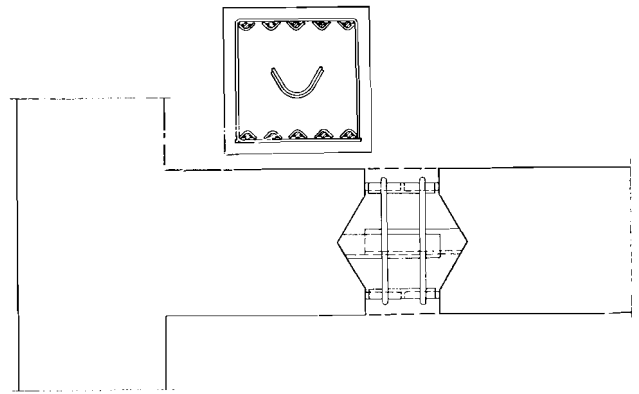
Jointing between column and beam. The beam is mounted on the support protruding from the columns. The reinforcement is welded to the bent connecting plates. The joint can now take the building load. At a suitable time the joint is concreted.
